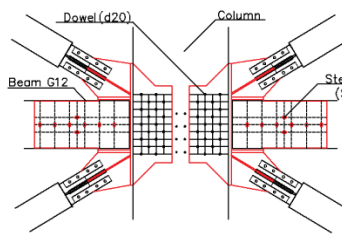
Beam-column connection at which BRB is attached (Y direction)
